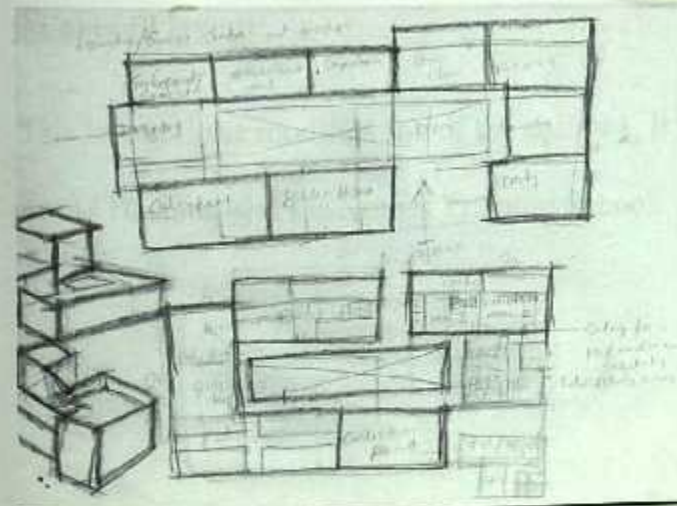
plan of the mortuary, laundry and sterilization unit as one.
